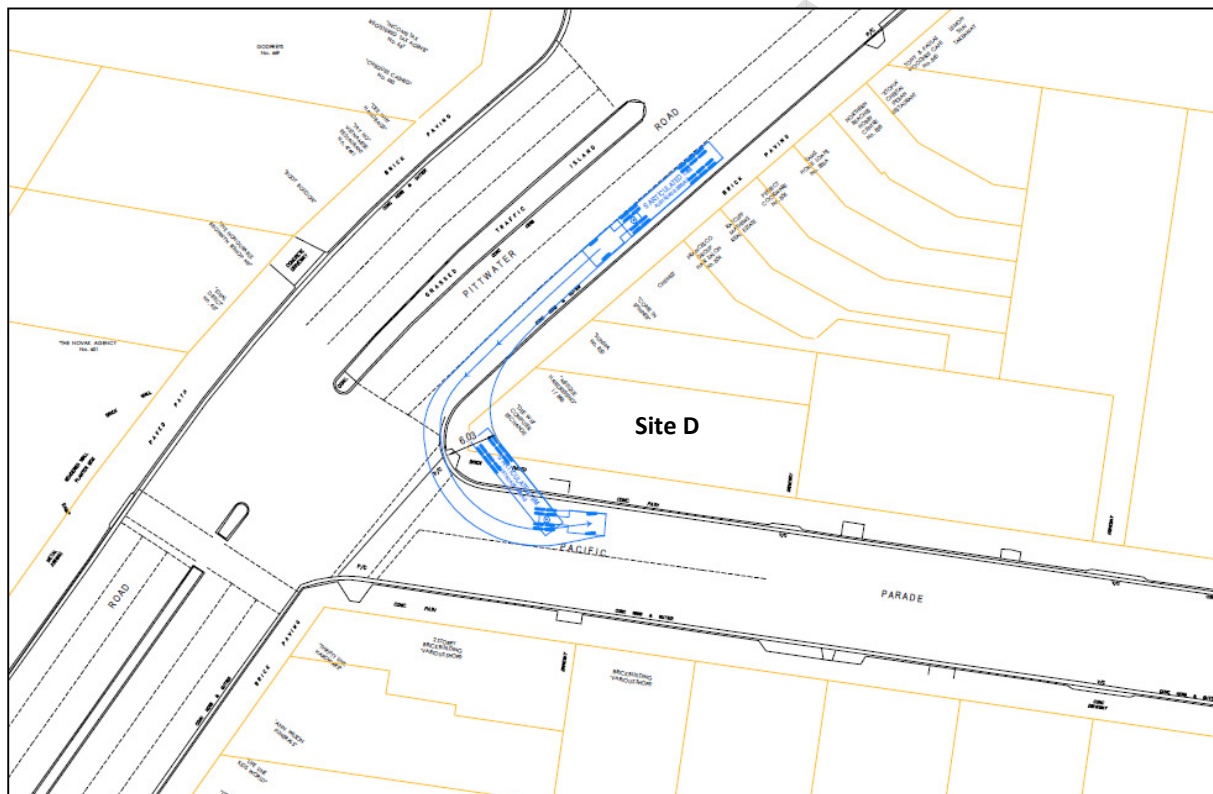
Proposed road widening plan Pacific Parade (not to scale)
